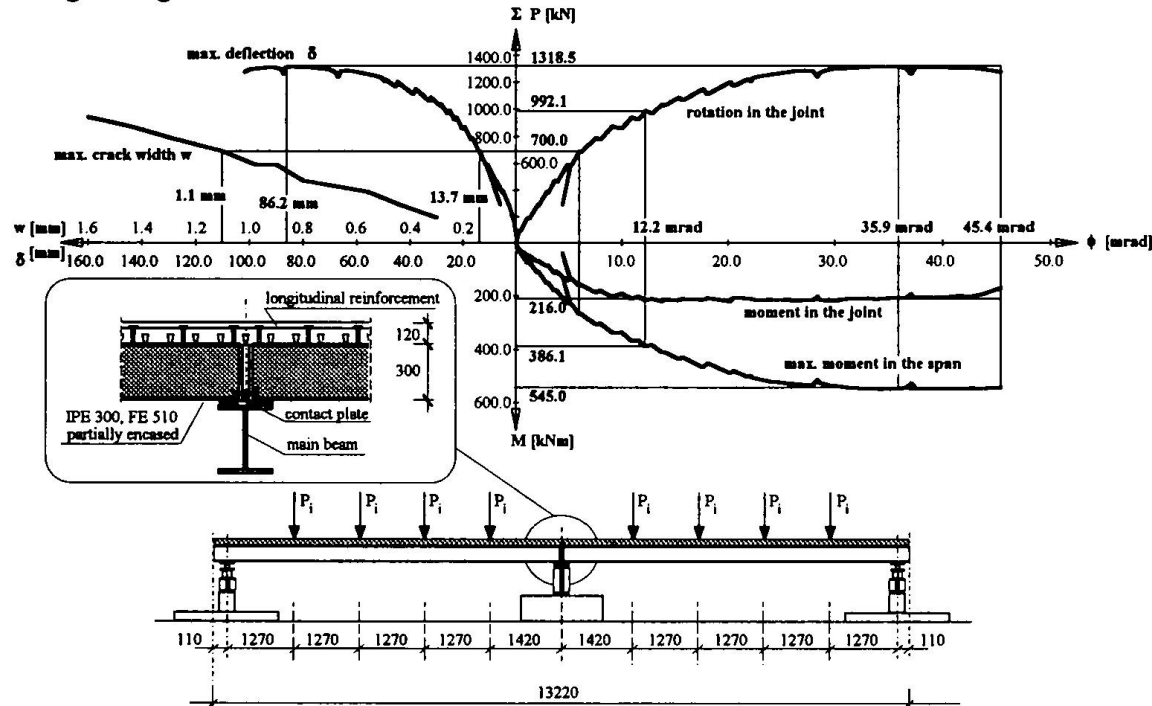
Results from a test with a semi-continuous floor beam [5]
